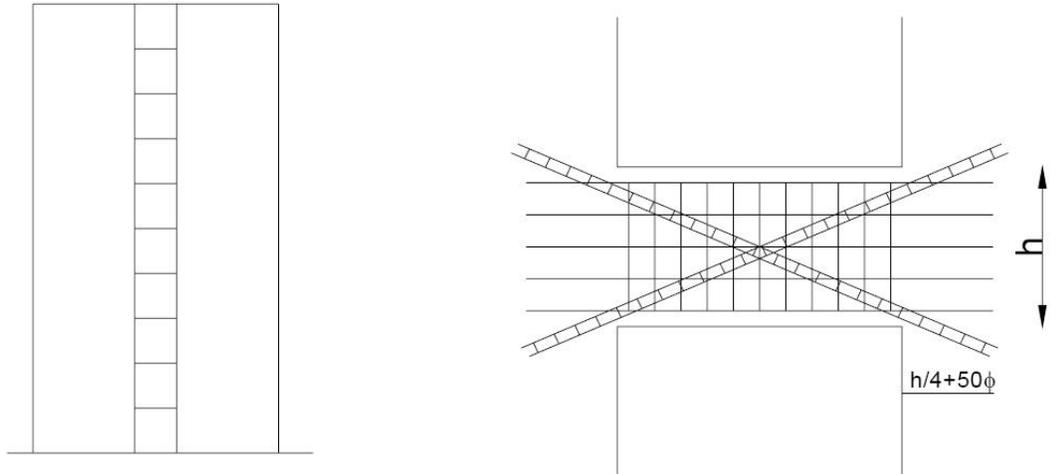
Coupled walls system (left), connecting beams reinforcement (right).
